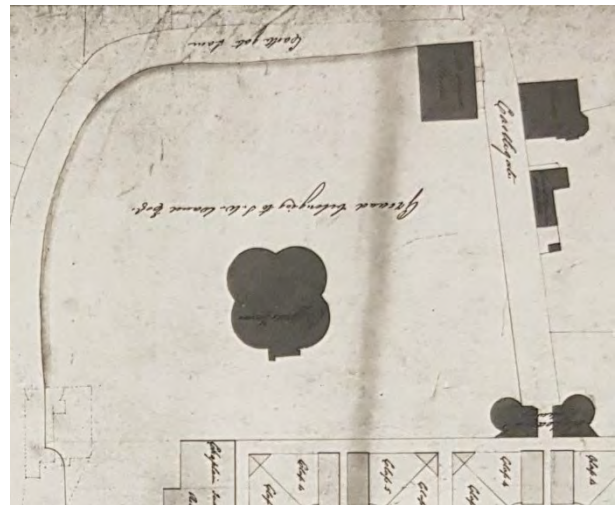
Extract from plan of 1824 showing Mr Waud's house and garden, with proposals for prison buildings to the south (Brierley, Leckenby and Keighley, HEA BF61945)
